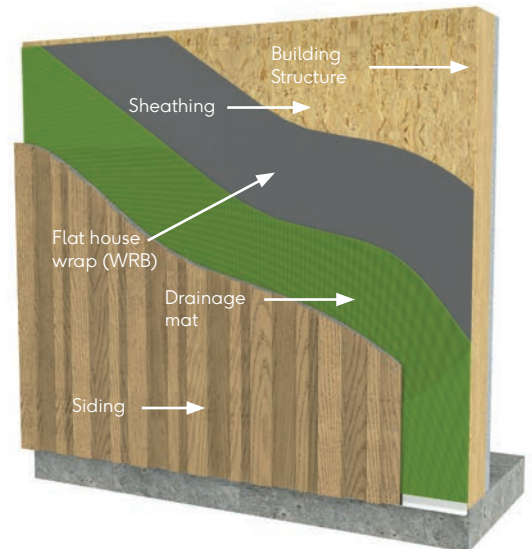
Typical wall build-up with rainscreen drainage mat
